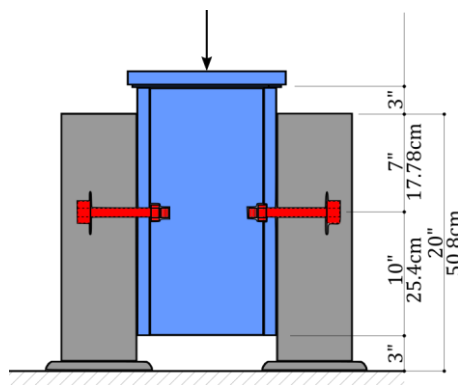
Pushout test specimen and its steel section before concreting [16]
